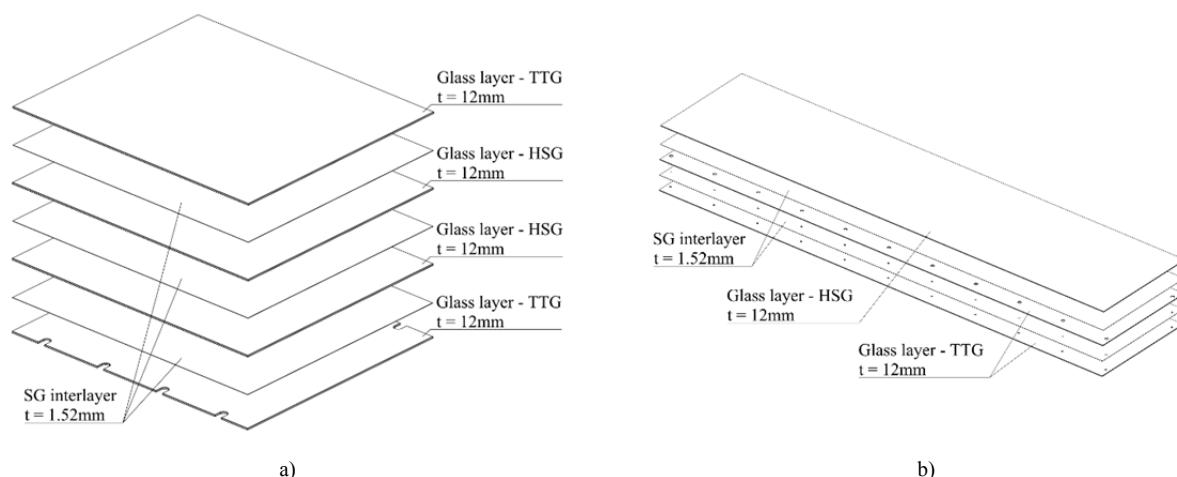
Exploded view of one of the 4 laminated floor slabs, b) exploded view of the laminated roof slab.
